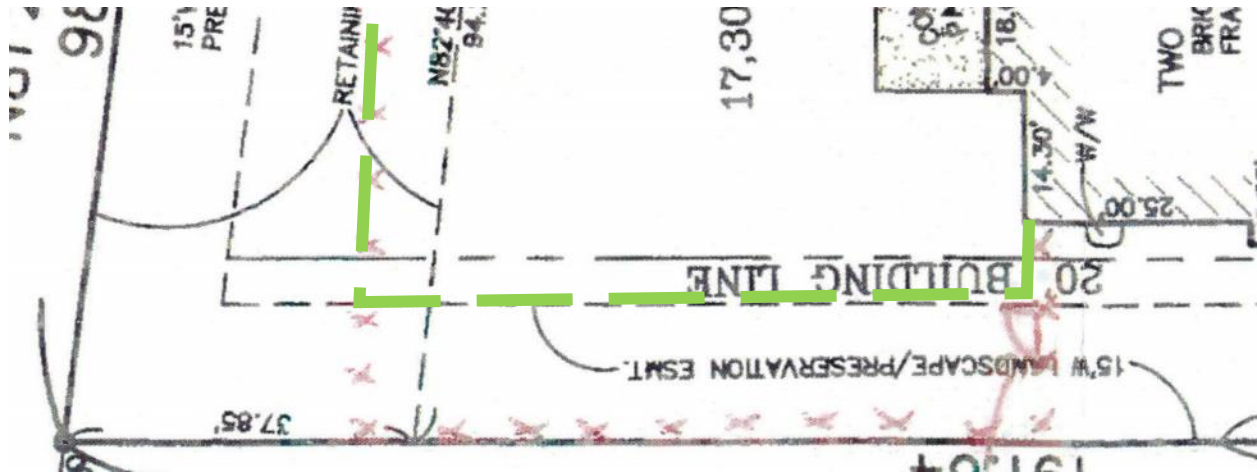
Close-up of the Site Plan with Staff's Recommended 15 foot setback highlighted in green.
